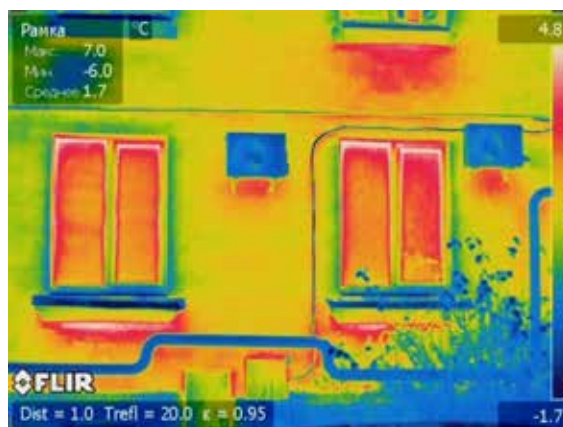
Heat leakage through the joints of walls and improperly installed windows units and air conditioners
